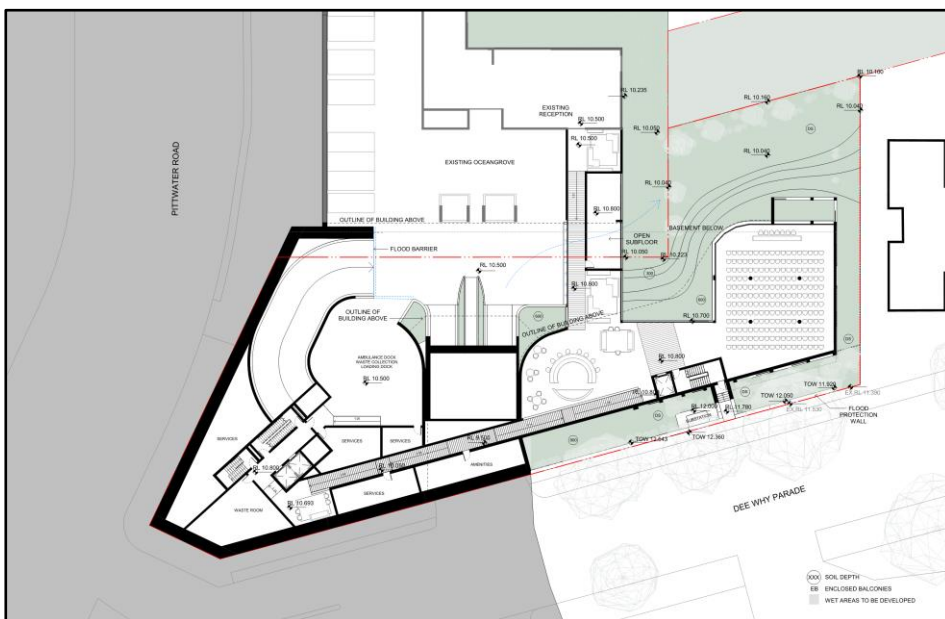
Proposed lower ground floor plan (Marchese Partners)
